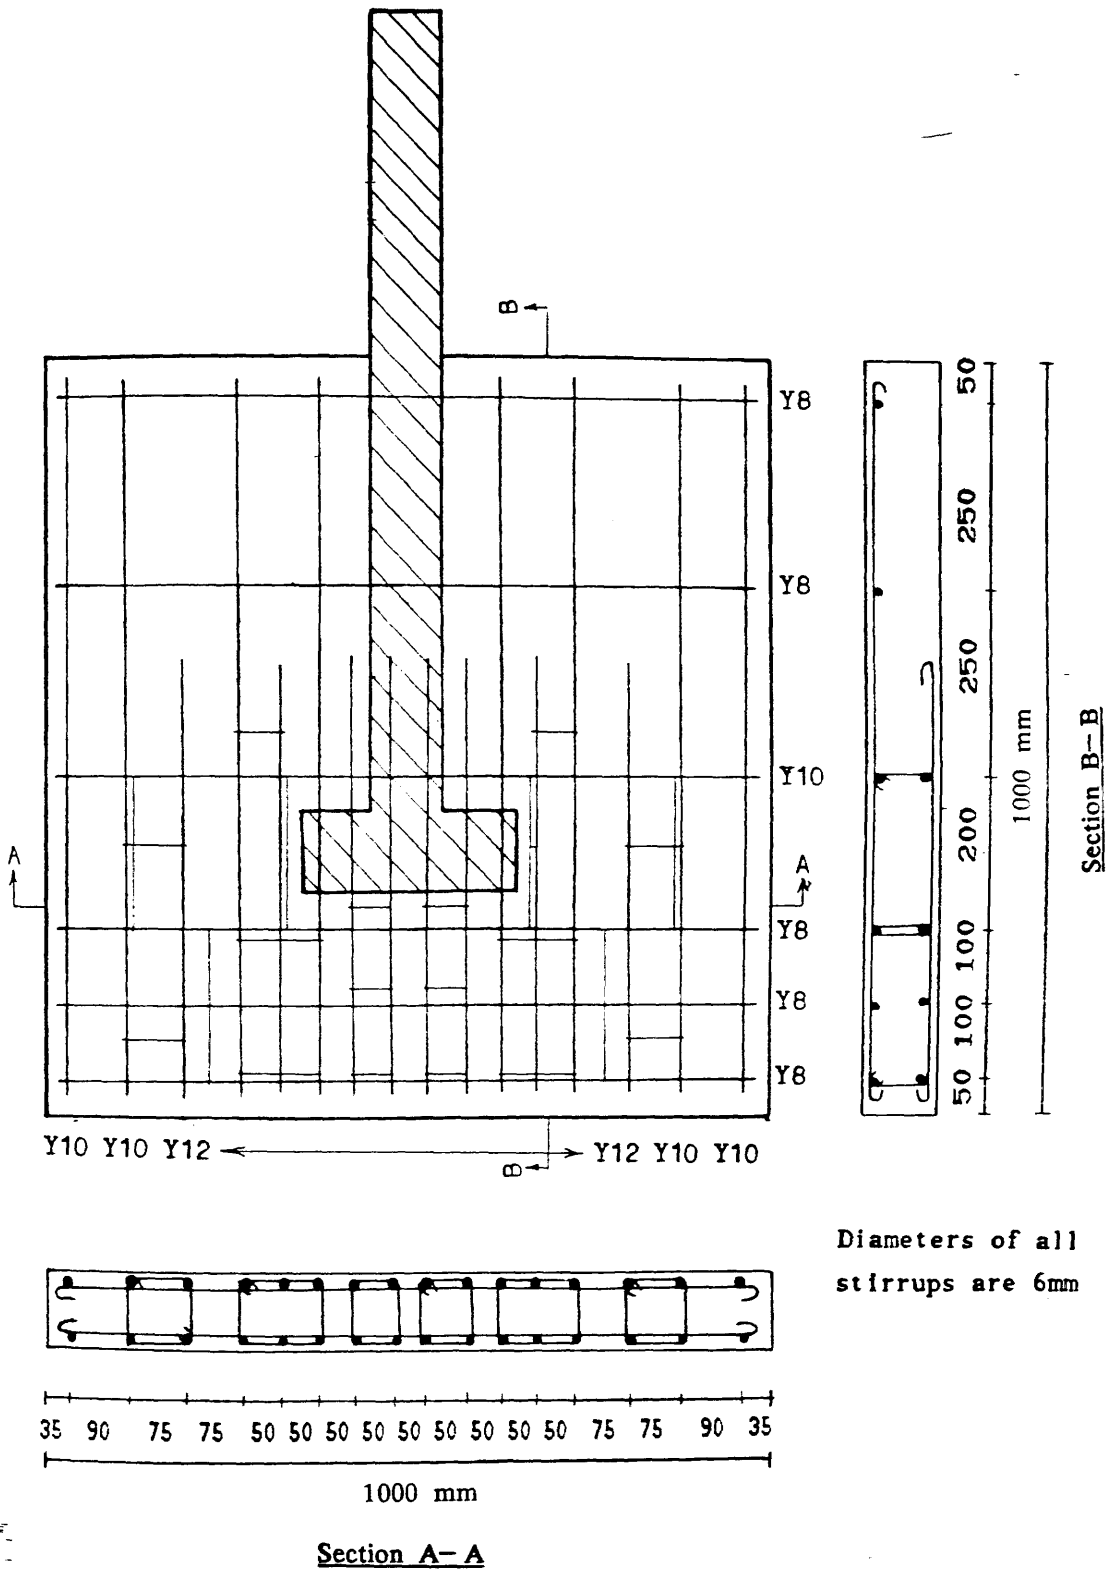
a) : Arrangement of top reinforcing bars including closed vertical stirrup in the slab of model MS10
